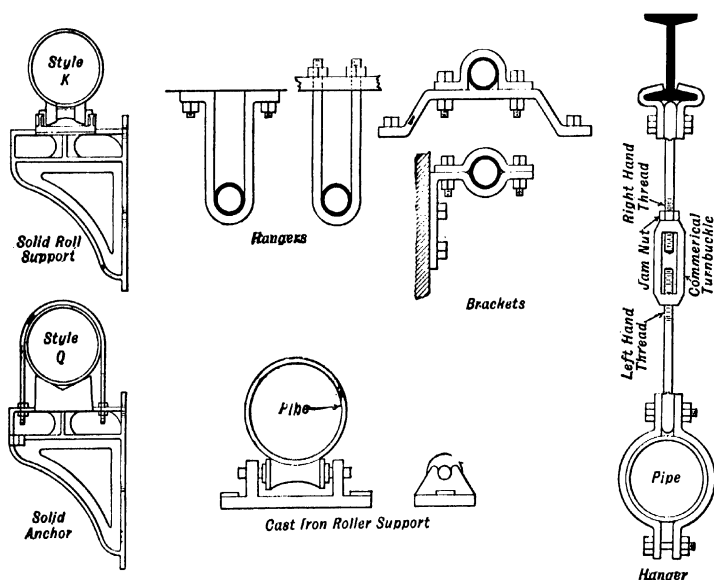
Typical Pipe Hangers, Brackets and Roller with Frame.
